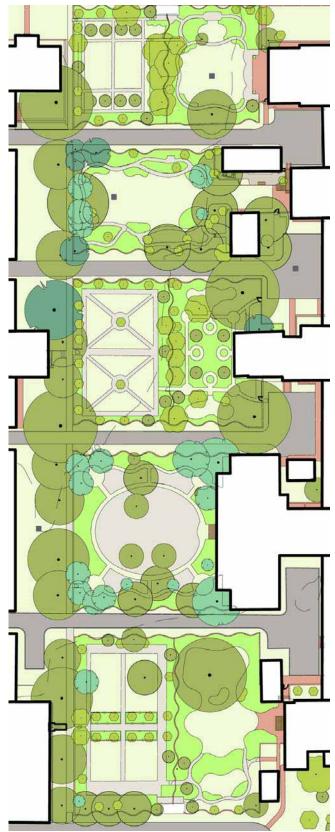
A- built configuration of the West Gardens is depicted on this portion of the 1981 Plan. (R-JAV_16 1981-West Gardens detail HL.jpg)
